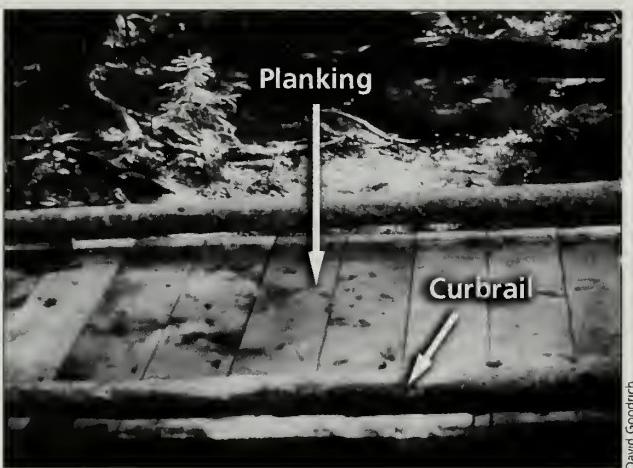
Plank bridge on the Pond Trail (#20) at the junction with the Triad Pass Trail (#29), shown here in 1958.
